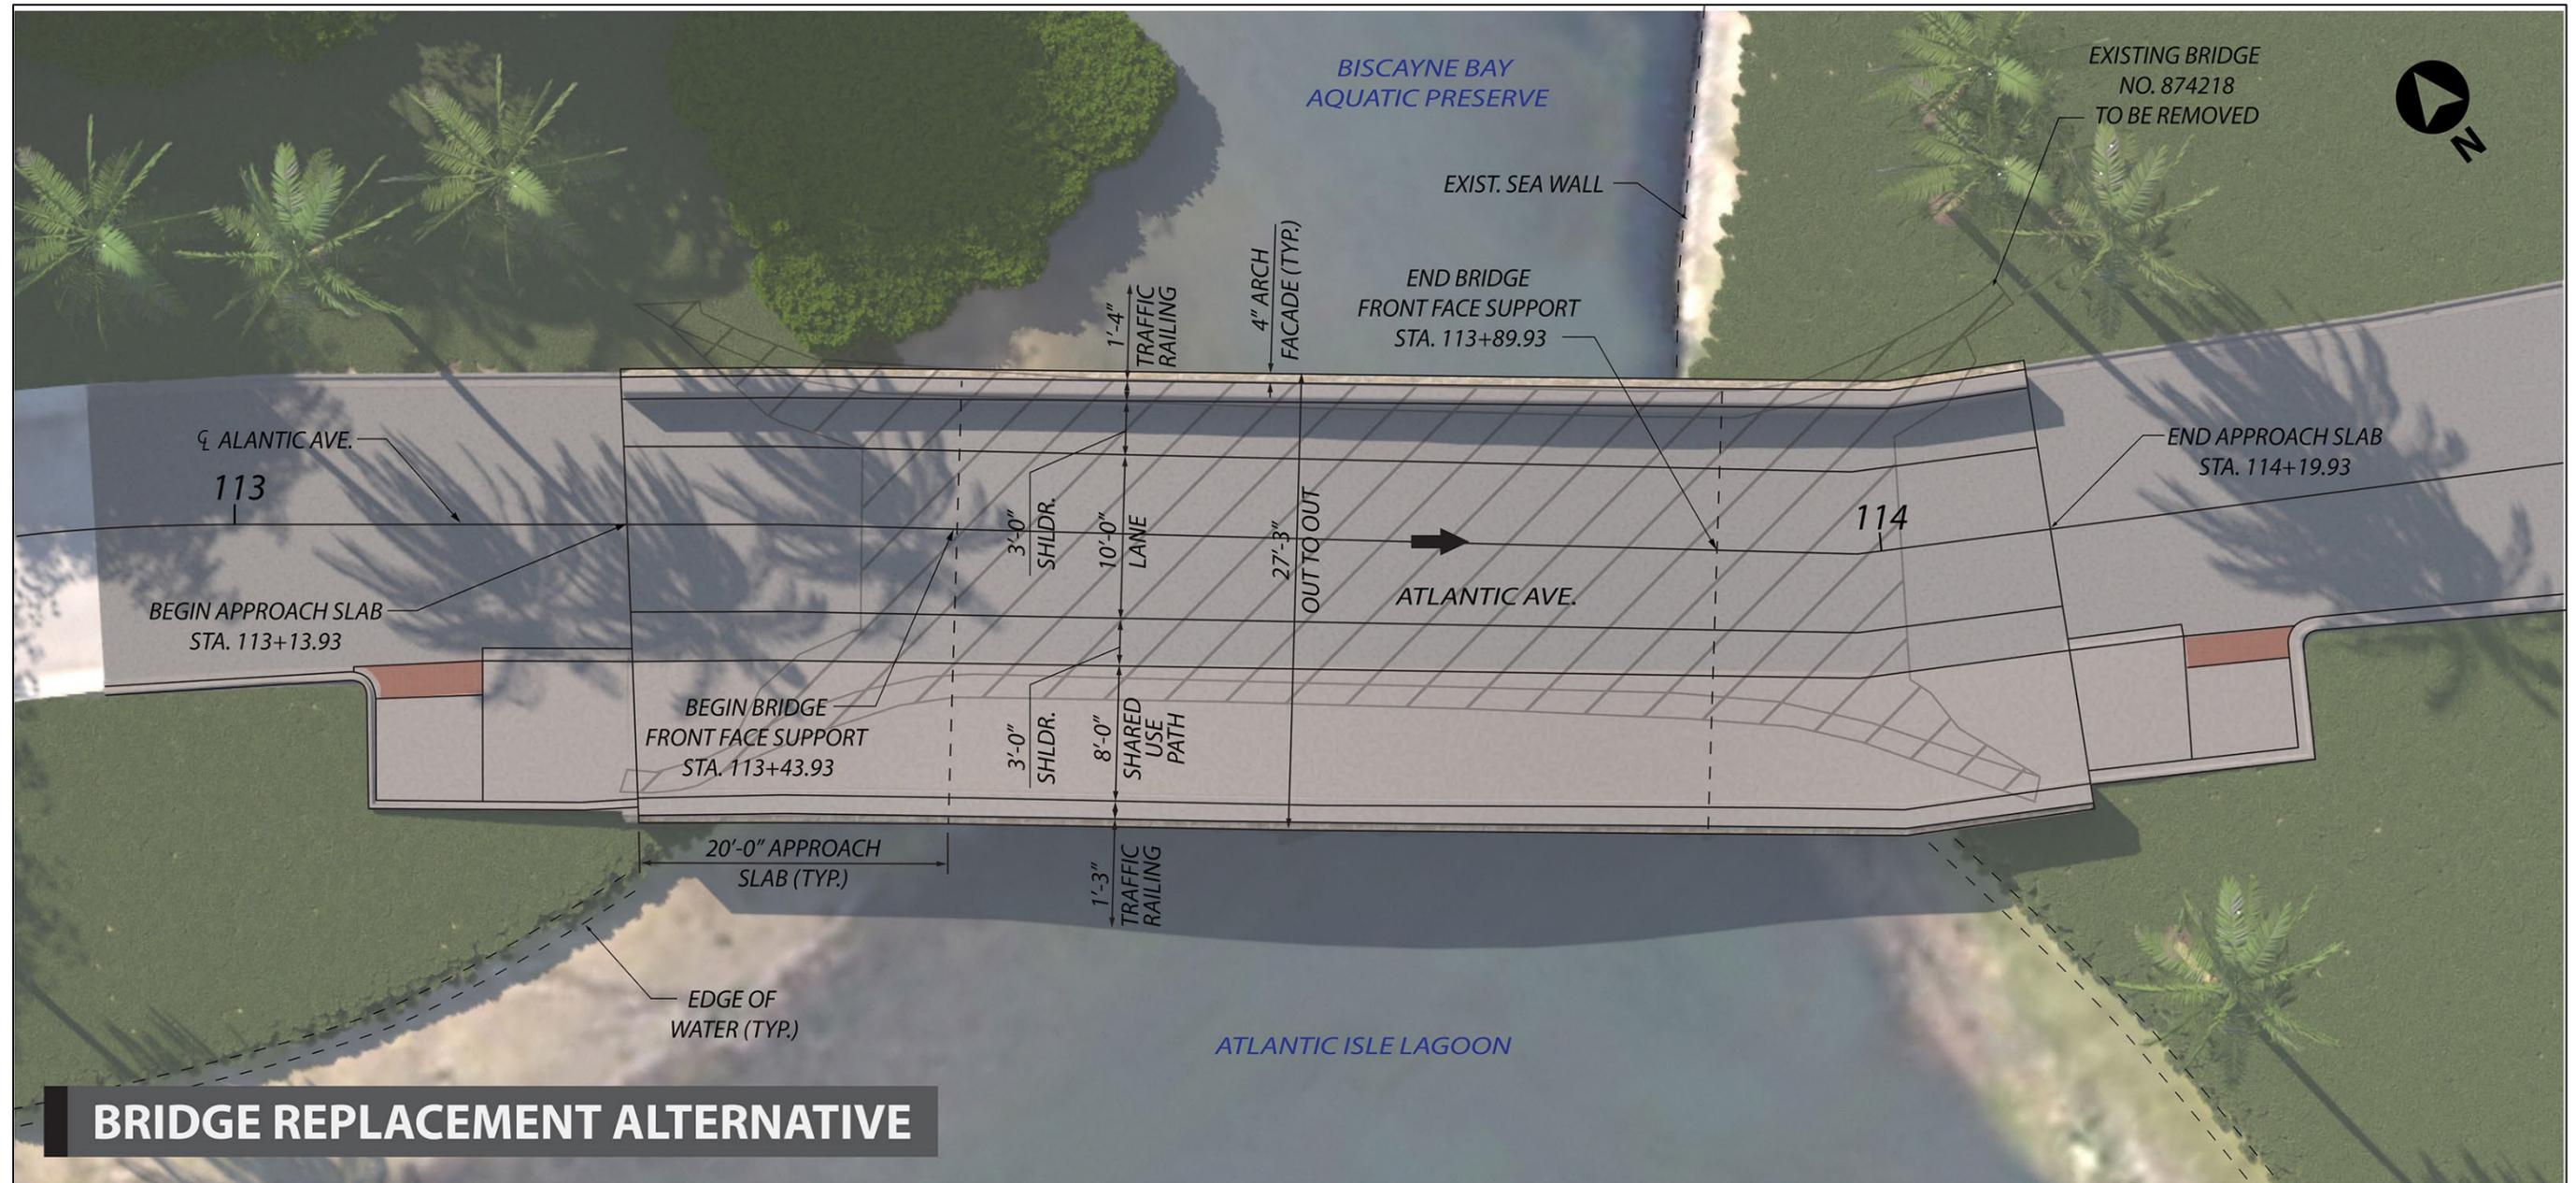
Replacement Alternative (Build Alternative #2): Plan View
